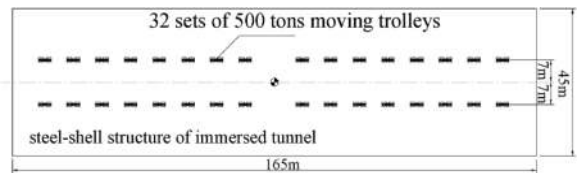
Layout diagram of rail type hydraulic carriage transport pipe section (Plan).
